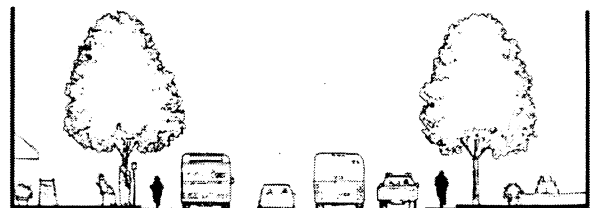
Cross-section of a bike lane between travel lanes and the curb
